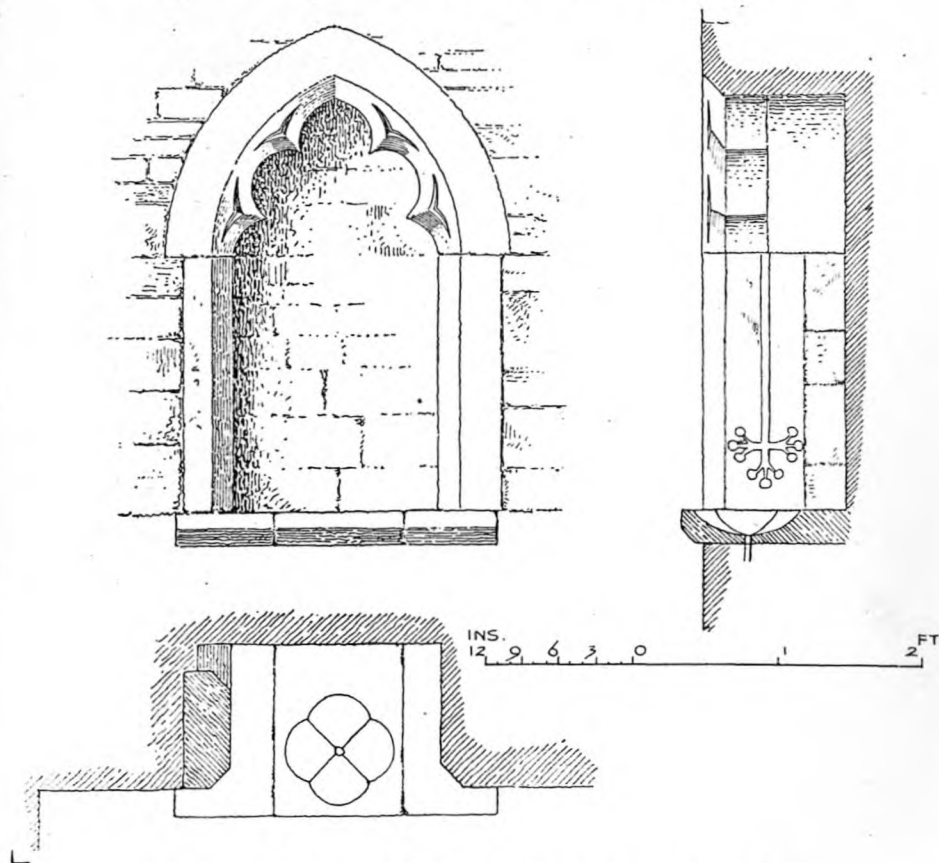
Elevation, Section, and Plan of Piscina in South Wall of Chapel at Llanblethian Church.
